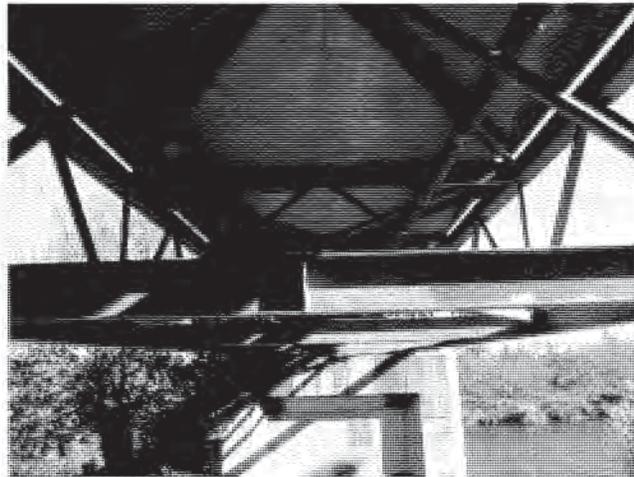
shows a horizontal beam with patches of paint added to cover graffiti.
